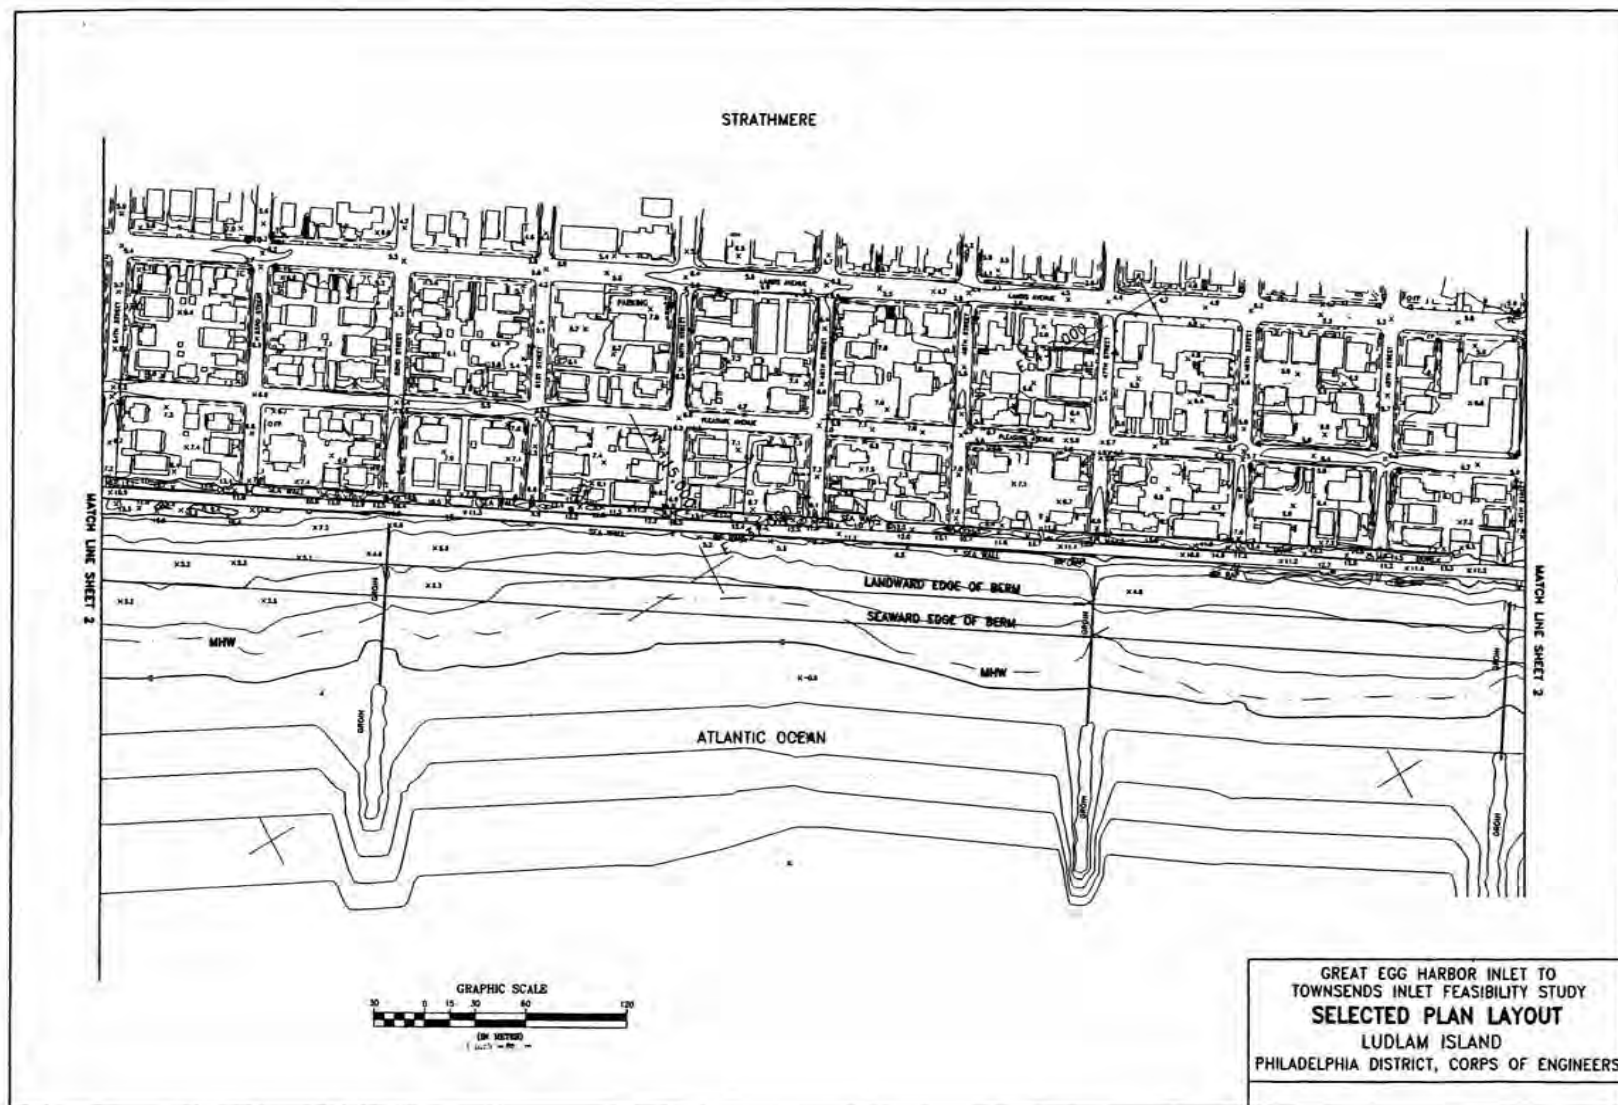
Selected Plan Layout for Ludlam Island, NJ – 44th Street to 54th Street, Sea Isle City
